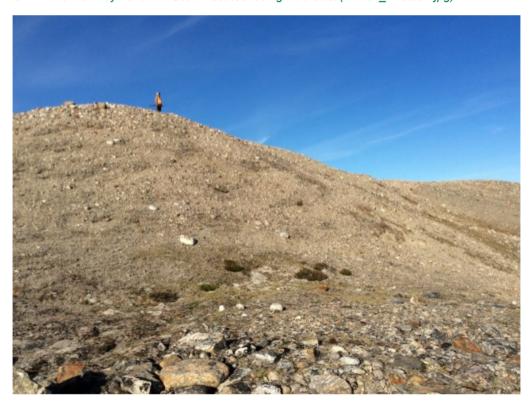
FOX-4 – Tanner Bay Landfill – South toe near river facing northeast (ATT35\_Photo35.jpg)
